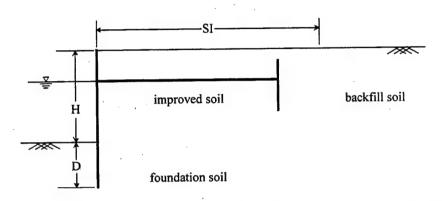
Definition Sketch Of An Anchored Sheetpile Bulkhead With Soil improvement
